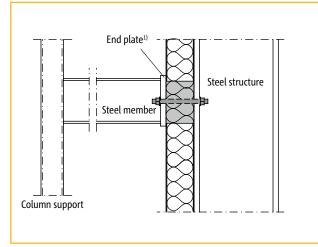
Schöck Isokorb® module, type KST-QST/KST-ZQST for supported steel structures
